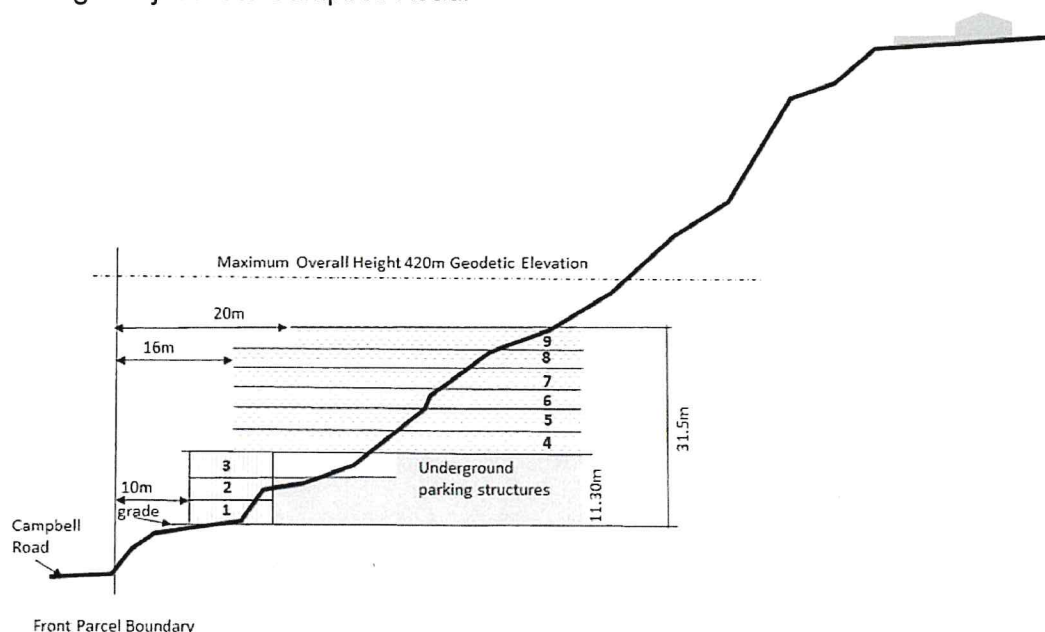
Maximum Overall Height and Maximum Building Heights with Staggered Setbacks
